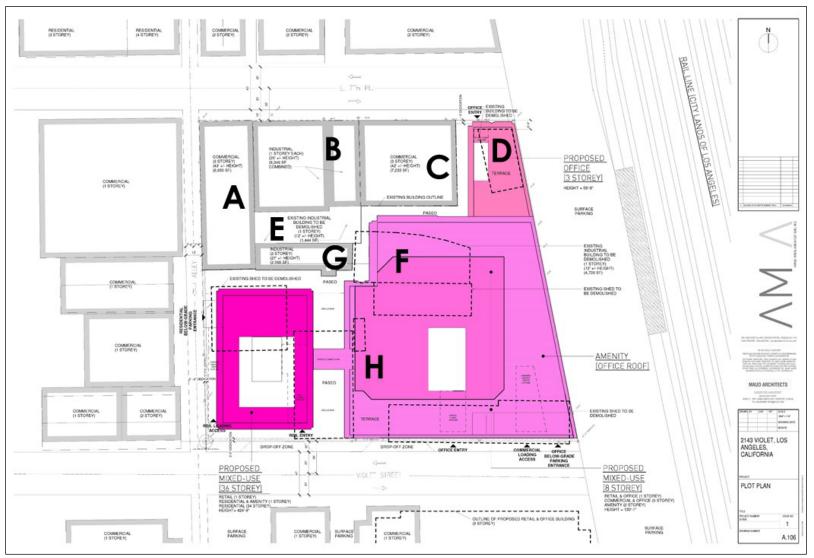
Site plan of proposed Project, showing buildings to be retained along E. 7th Place (AMA, October 2018)
